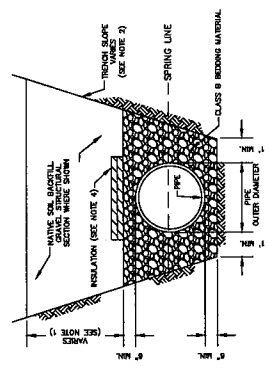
DETAIL 'A' - STRUCTURAL TRENCH SECTION
